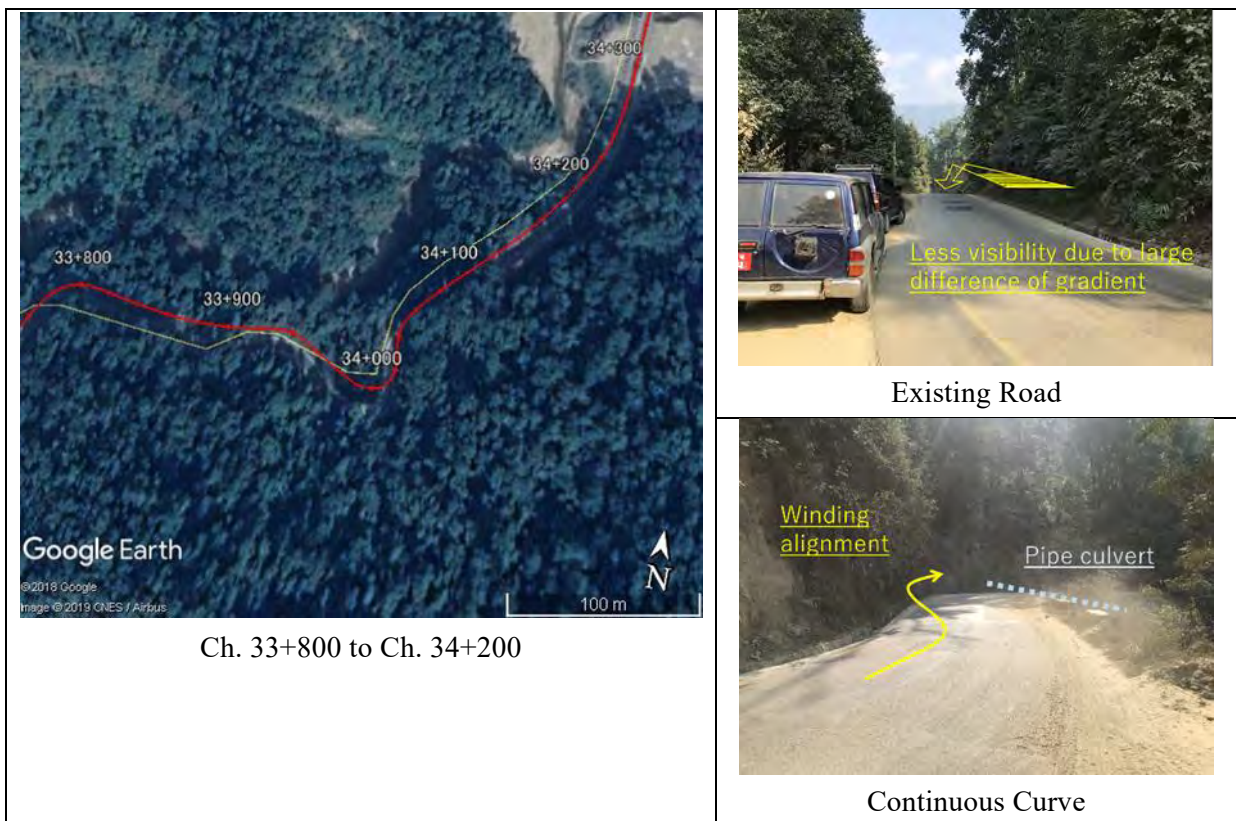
Current Situations of the Road Section from Ch. 33+800 to Ch. 34+200
